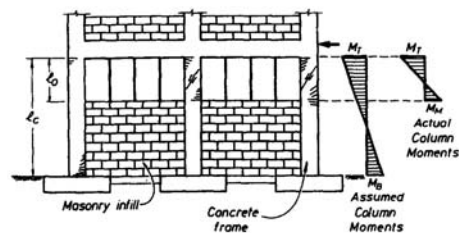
Partial masonry infill in concrete frame (Paulay and Priestley, 1992)
